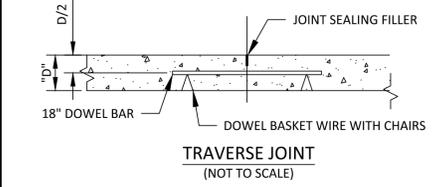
DETAIL OF SEALED CONTRACTION JOINT SAWCUT
